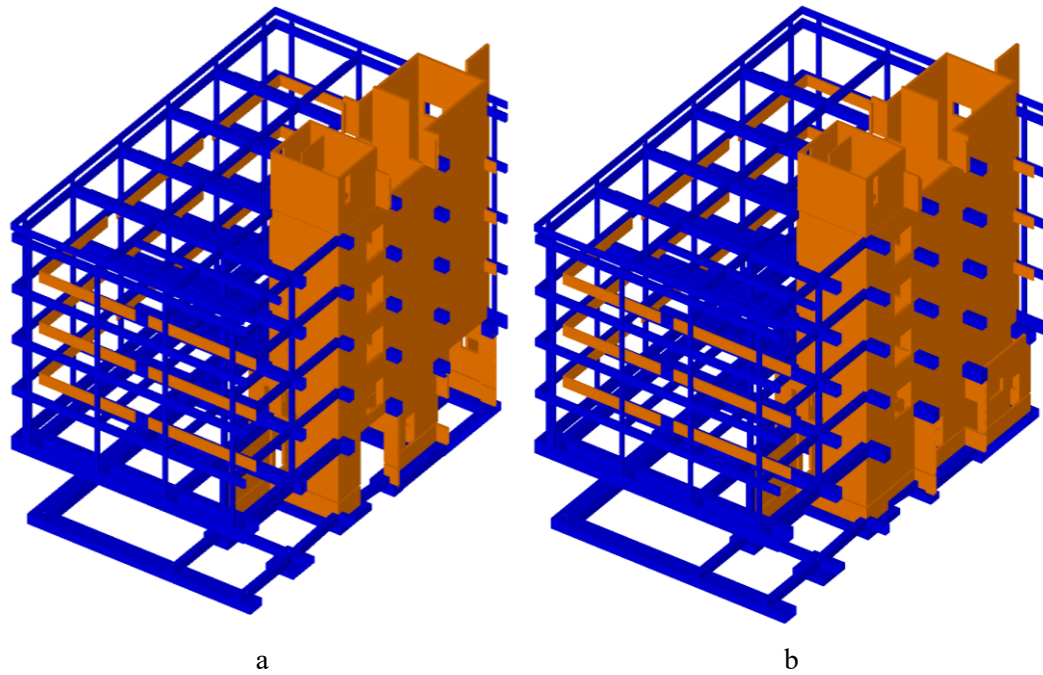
Pyne Gould Building, as-built (a) and retrofitted (b) configuration.
